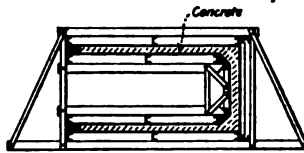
Mould for Voussoir Block, Belvidere Bridge.
